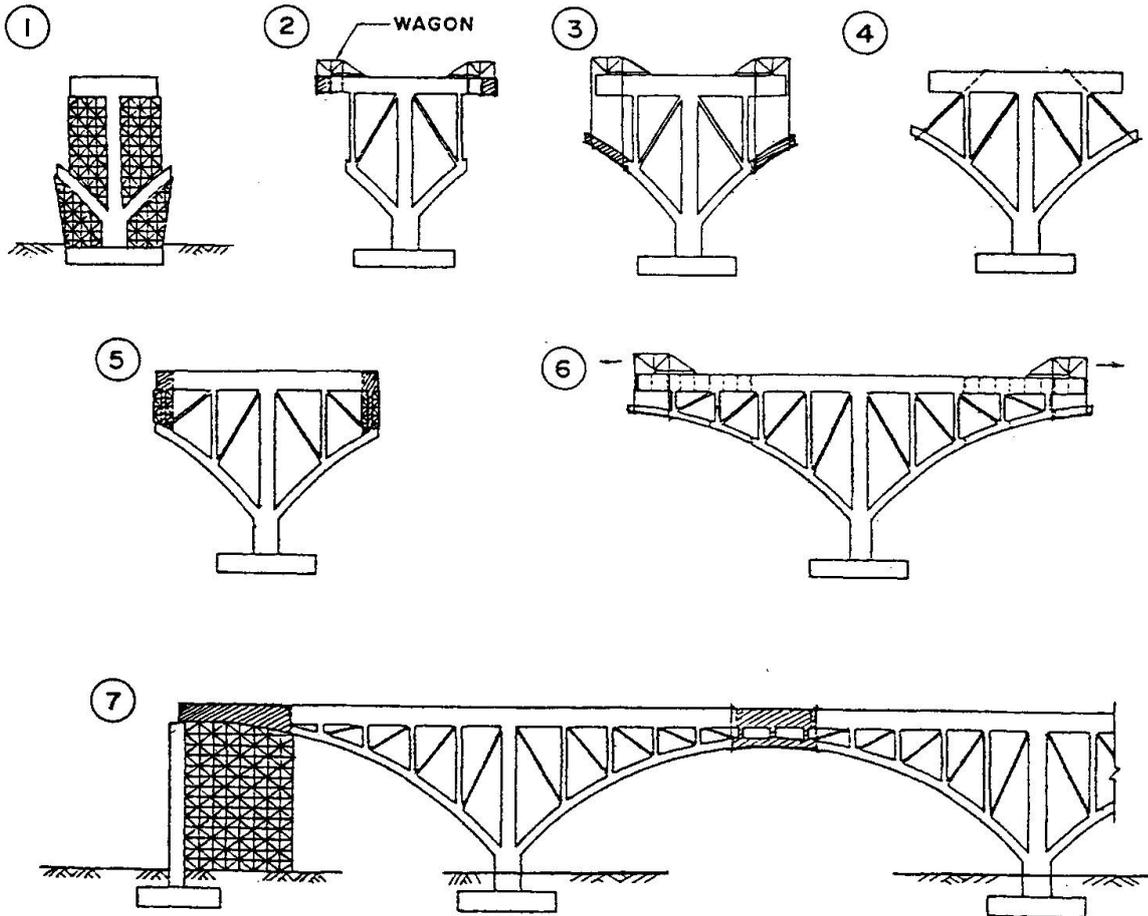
Erection sequence (1. Erection of pier column and first segment. 2. Erection of box girder with moveable wagon. 3. Erection of arch rib with wagon. 4. Placement of oblique constructional PC steel bars. 5. Erection of spandrel strut. 6. Repetition of process from stage 2 to stage 5. 7. Erection of arch crown section with hanging support and end side section with temporary support.).
